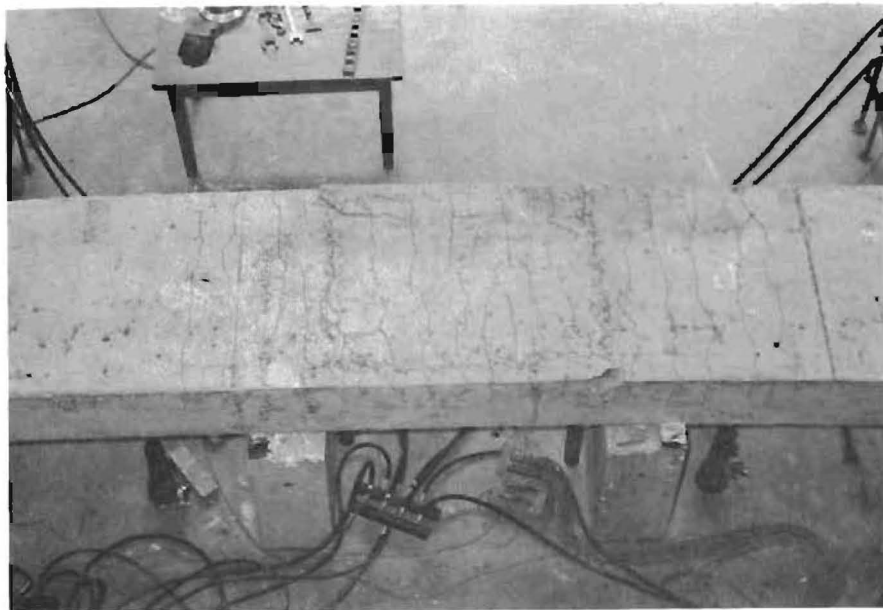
Tension face of 11-45-4/1/2-6/6 after failure
